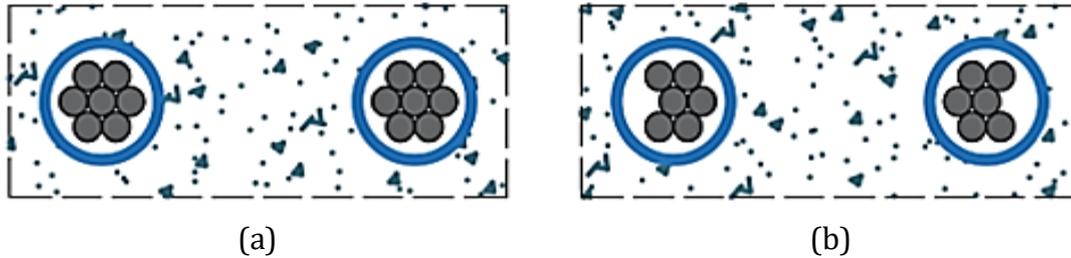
Undamaged and damaged Strand damage patterns of the tested beam
